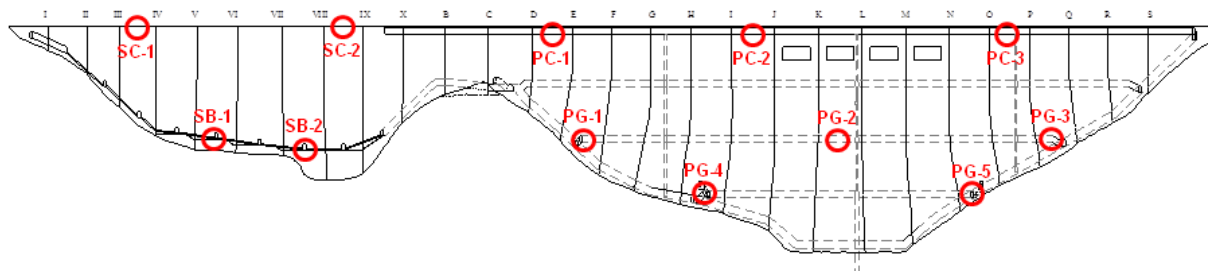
Elevation view of the dam with the planned locations of core extraction for the study of the concrete's pathology
